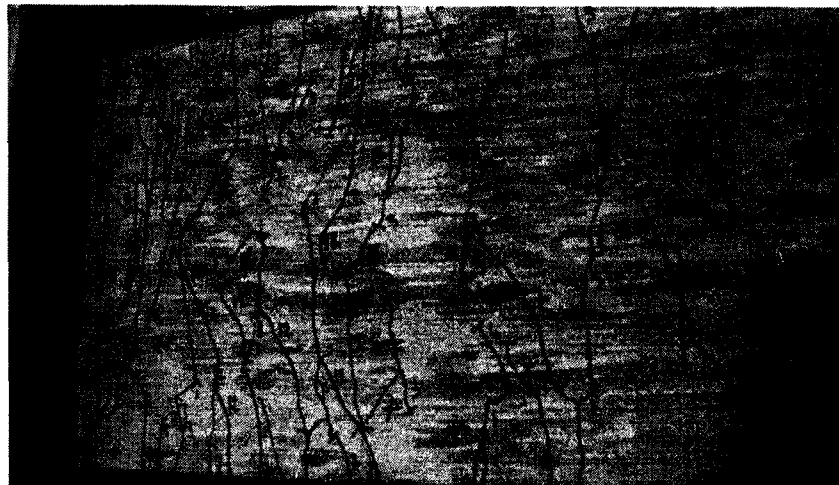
Cracking of beam- column joint at various drift levels (Specimen 2)
